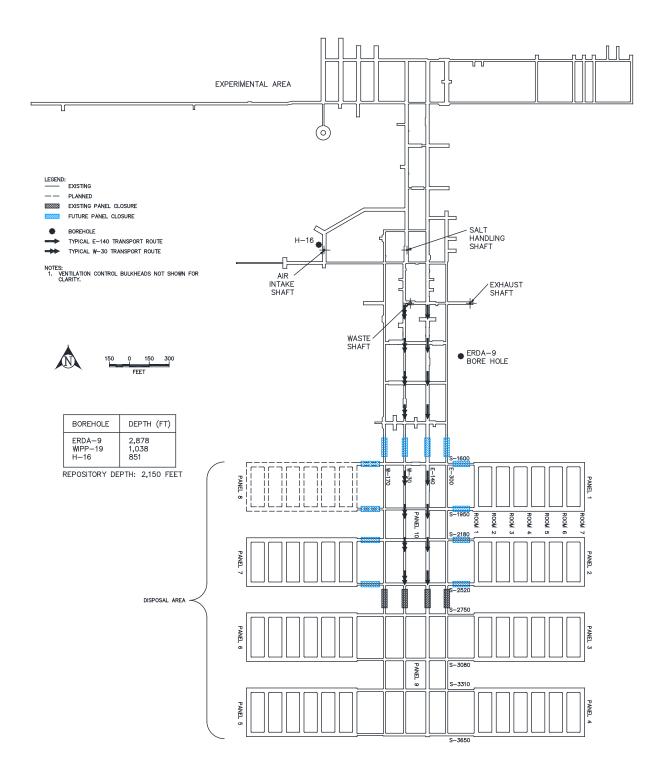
Repository Horizon and Underground Waste Transport Routes
